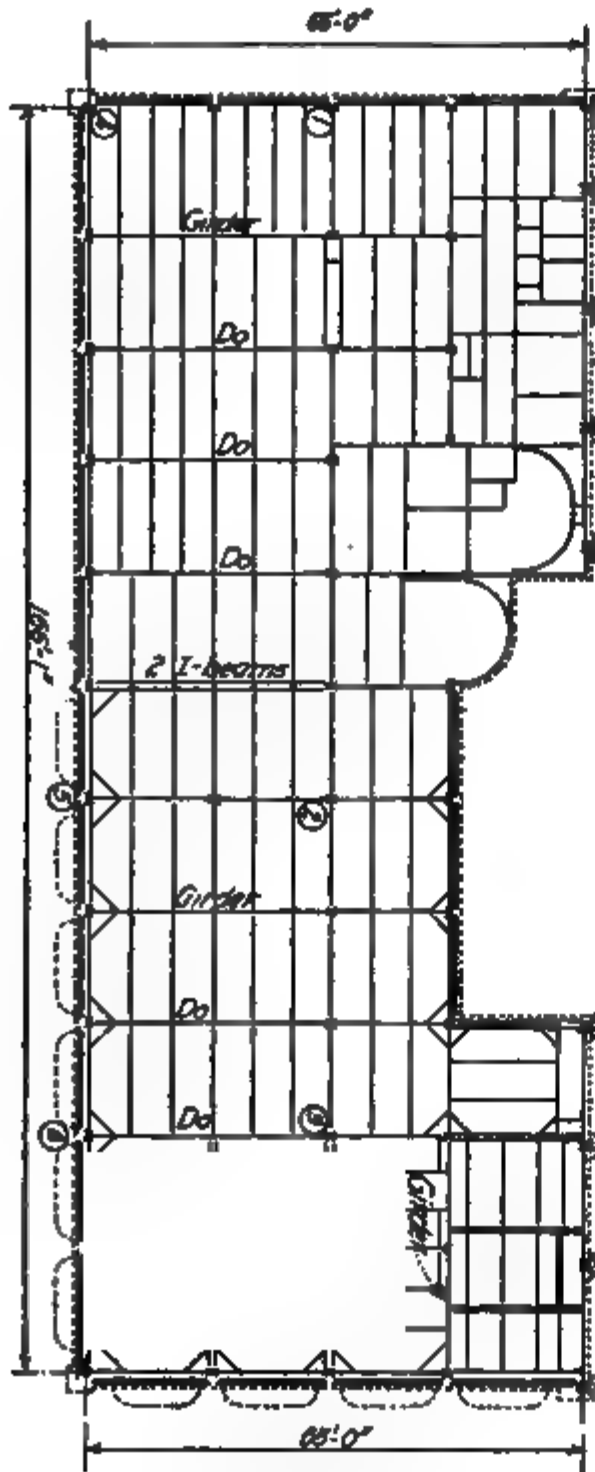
Ninth floor framing plan, University Club of Chicago.
